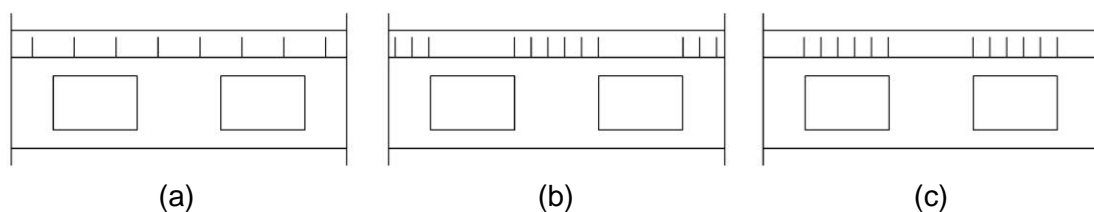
Alternatives of layout of shear studs a) uniform, b) grouped above the web-posts and c) grouped above the openings.
